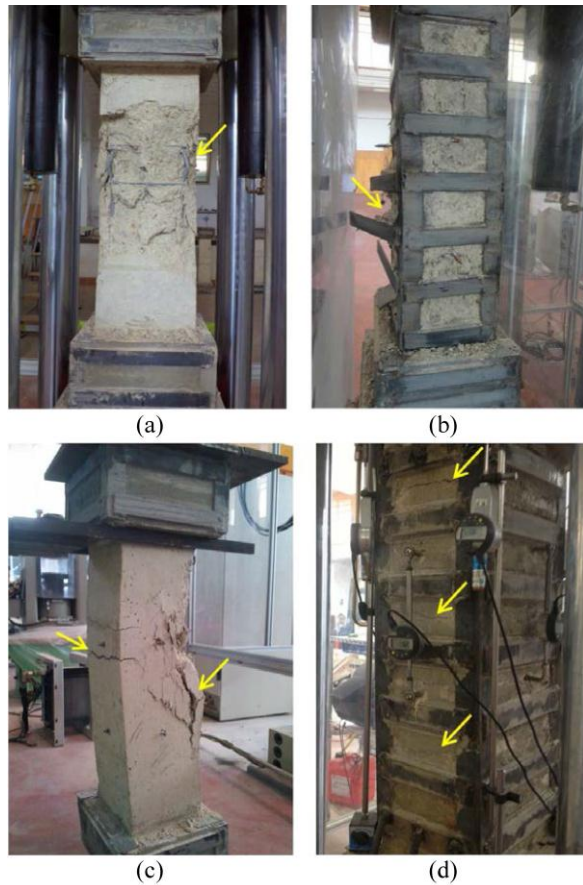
Typical failure of unreinforced and reinforced specimens: Axial load without eccentricity (a and b); eccentric load (c and d).
